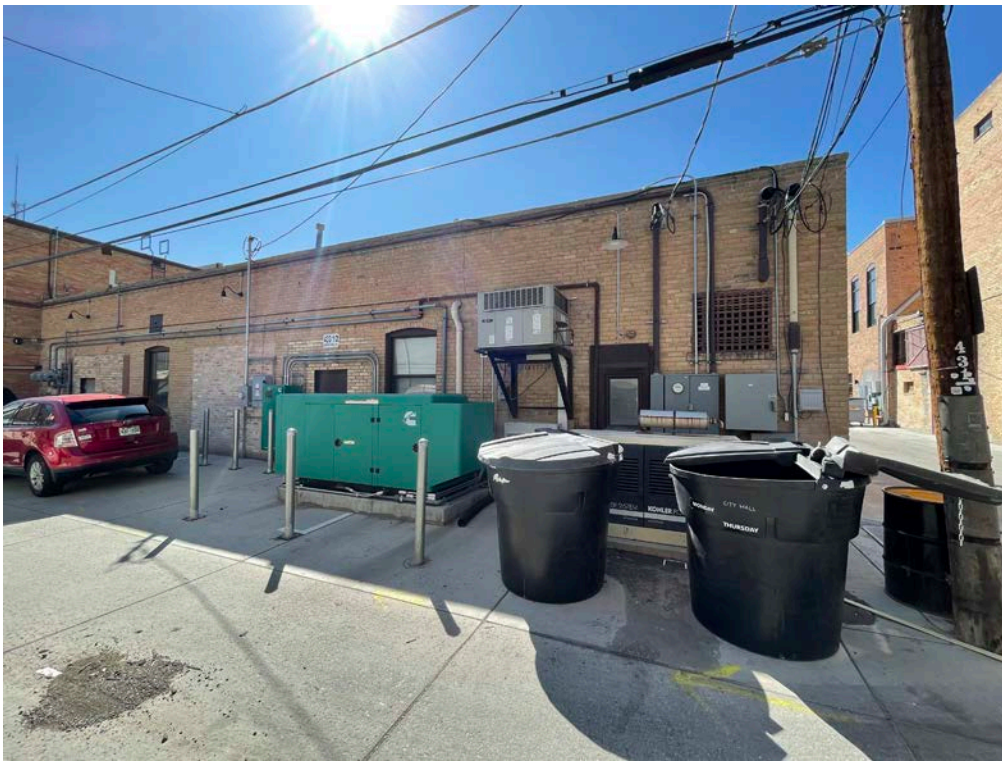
Annex north elevation, west end of building at alley. Montrose City IT Area.
